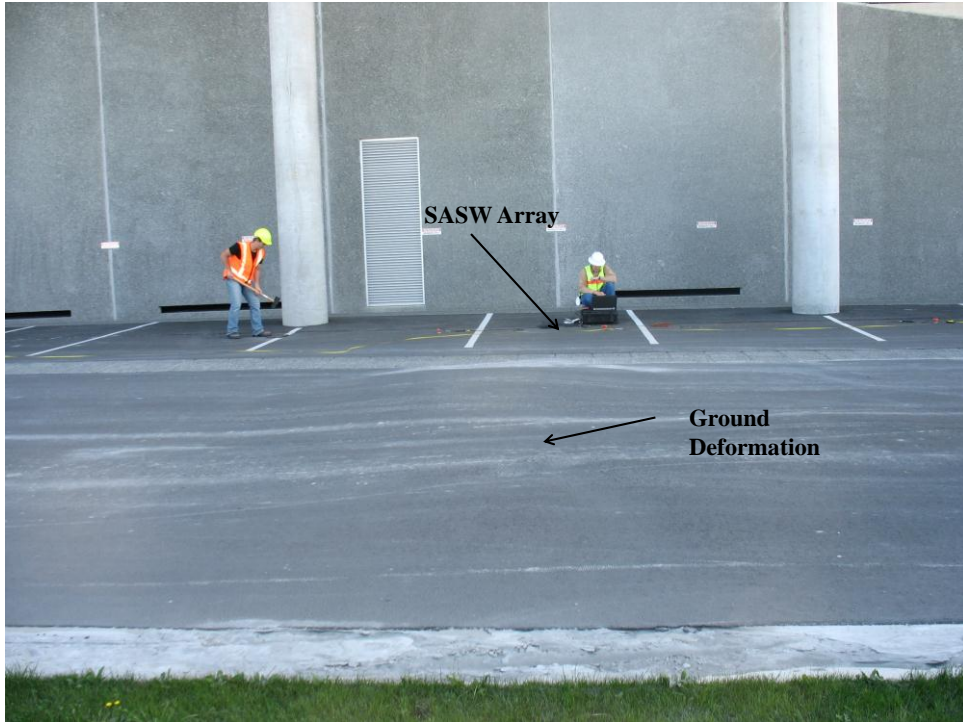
SASW array at AMI Columns test site. (-43.54128°, 172. 65562°)
